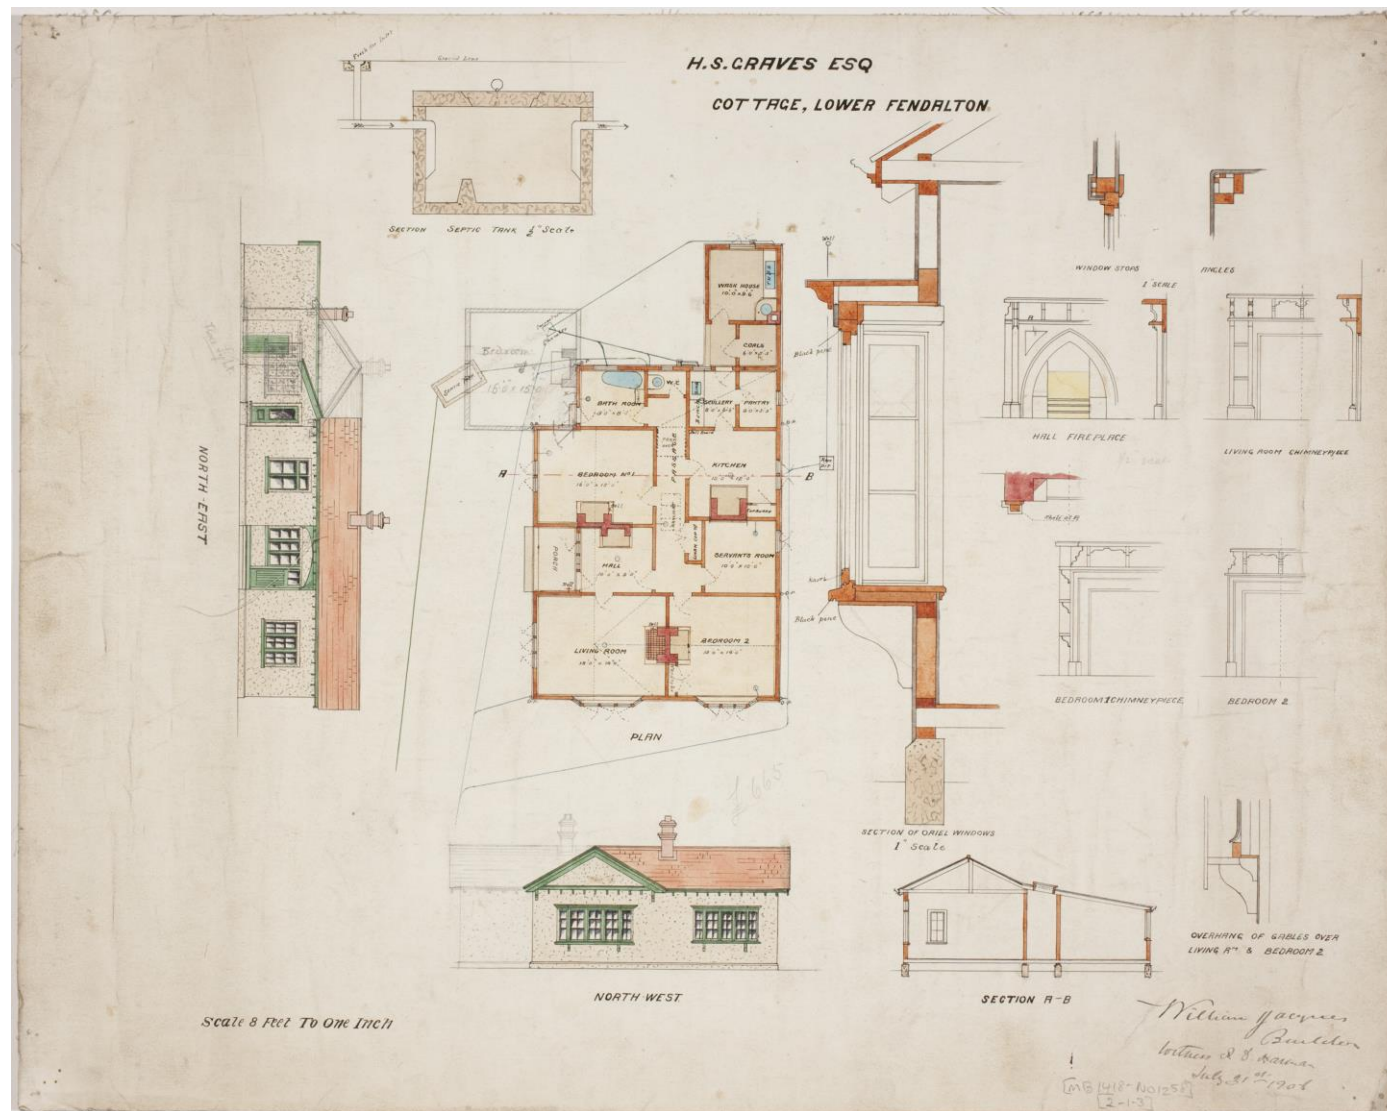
Collins and Harman, H. S. Graves, Esq., Cottage at Lower Fendalton, plans, elevations, section and details (1906).
